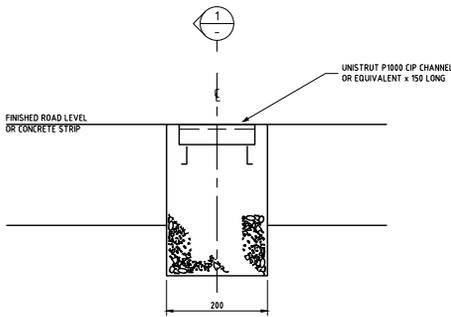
1 J SUPPORT WIRE END 5302,5303 (ALSO TYPICAL FOR BARBED WIRE)
